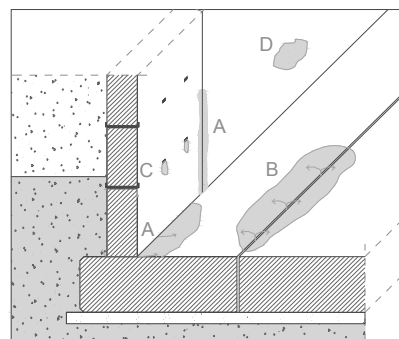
Infiltrations through below-grade walls and slabs. Water spots usually appears where there are construction joints (A, B) or where there are inadequate retaining ties (C) are used or cracks (D).
